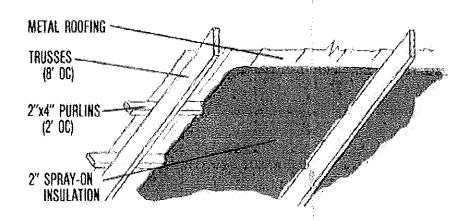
Spray-on roof insulation (R=13). Spray-on roof insulation should be protected from moisture it used in buildings where humidity is high. If fire protected, it is satisfactory for farm shops or buildings with low moisture levels.
